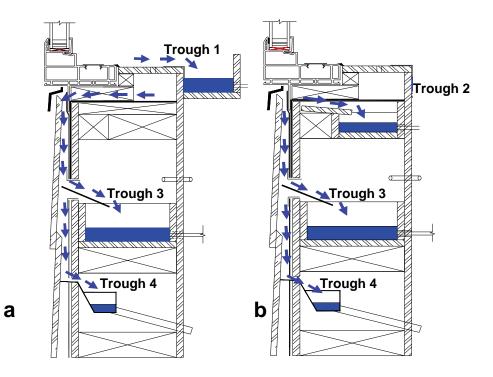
Collection trough locations (a) without subsill water collection and (b) with subsill collection in Trough 2, showing intended path of water drainage and collection.
